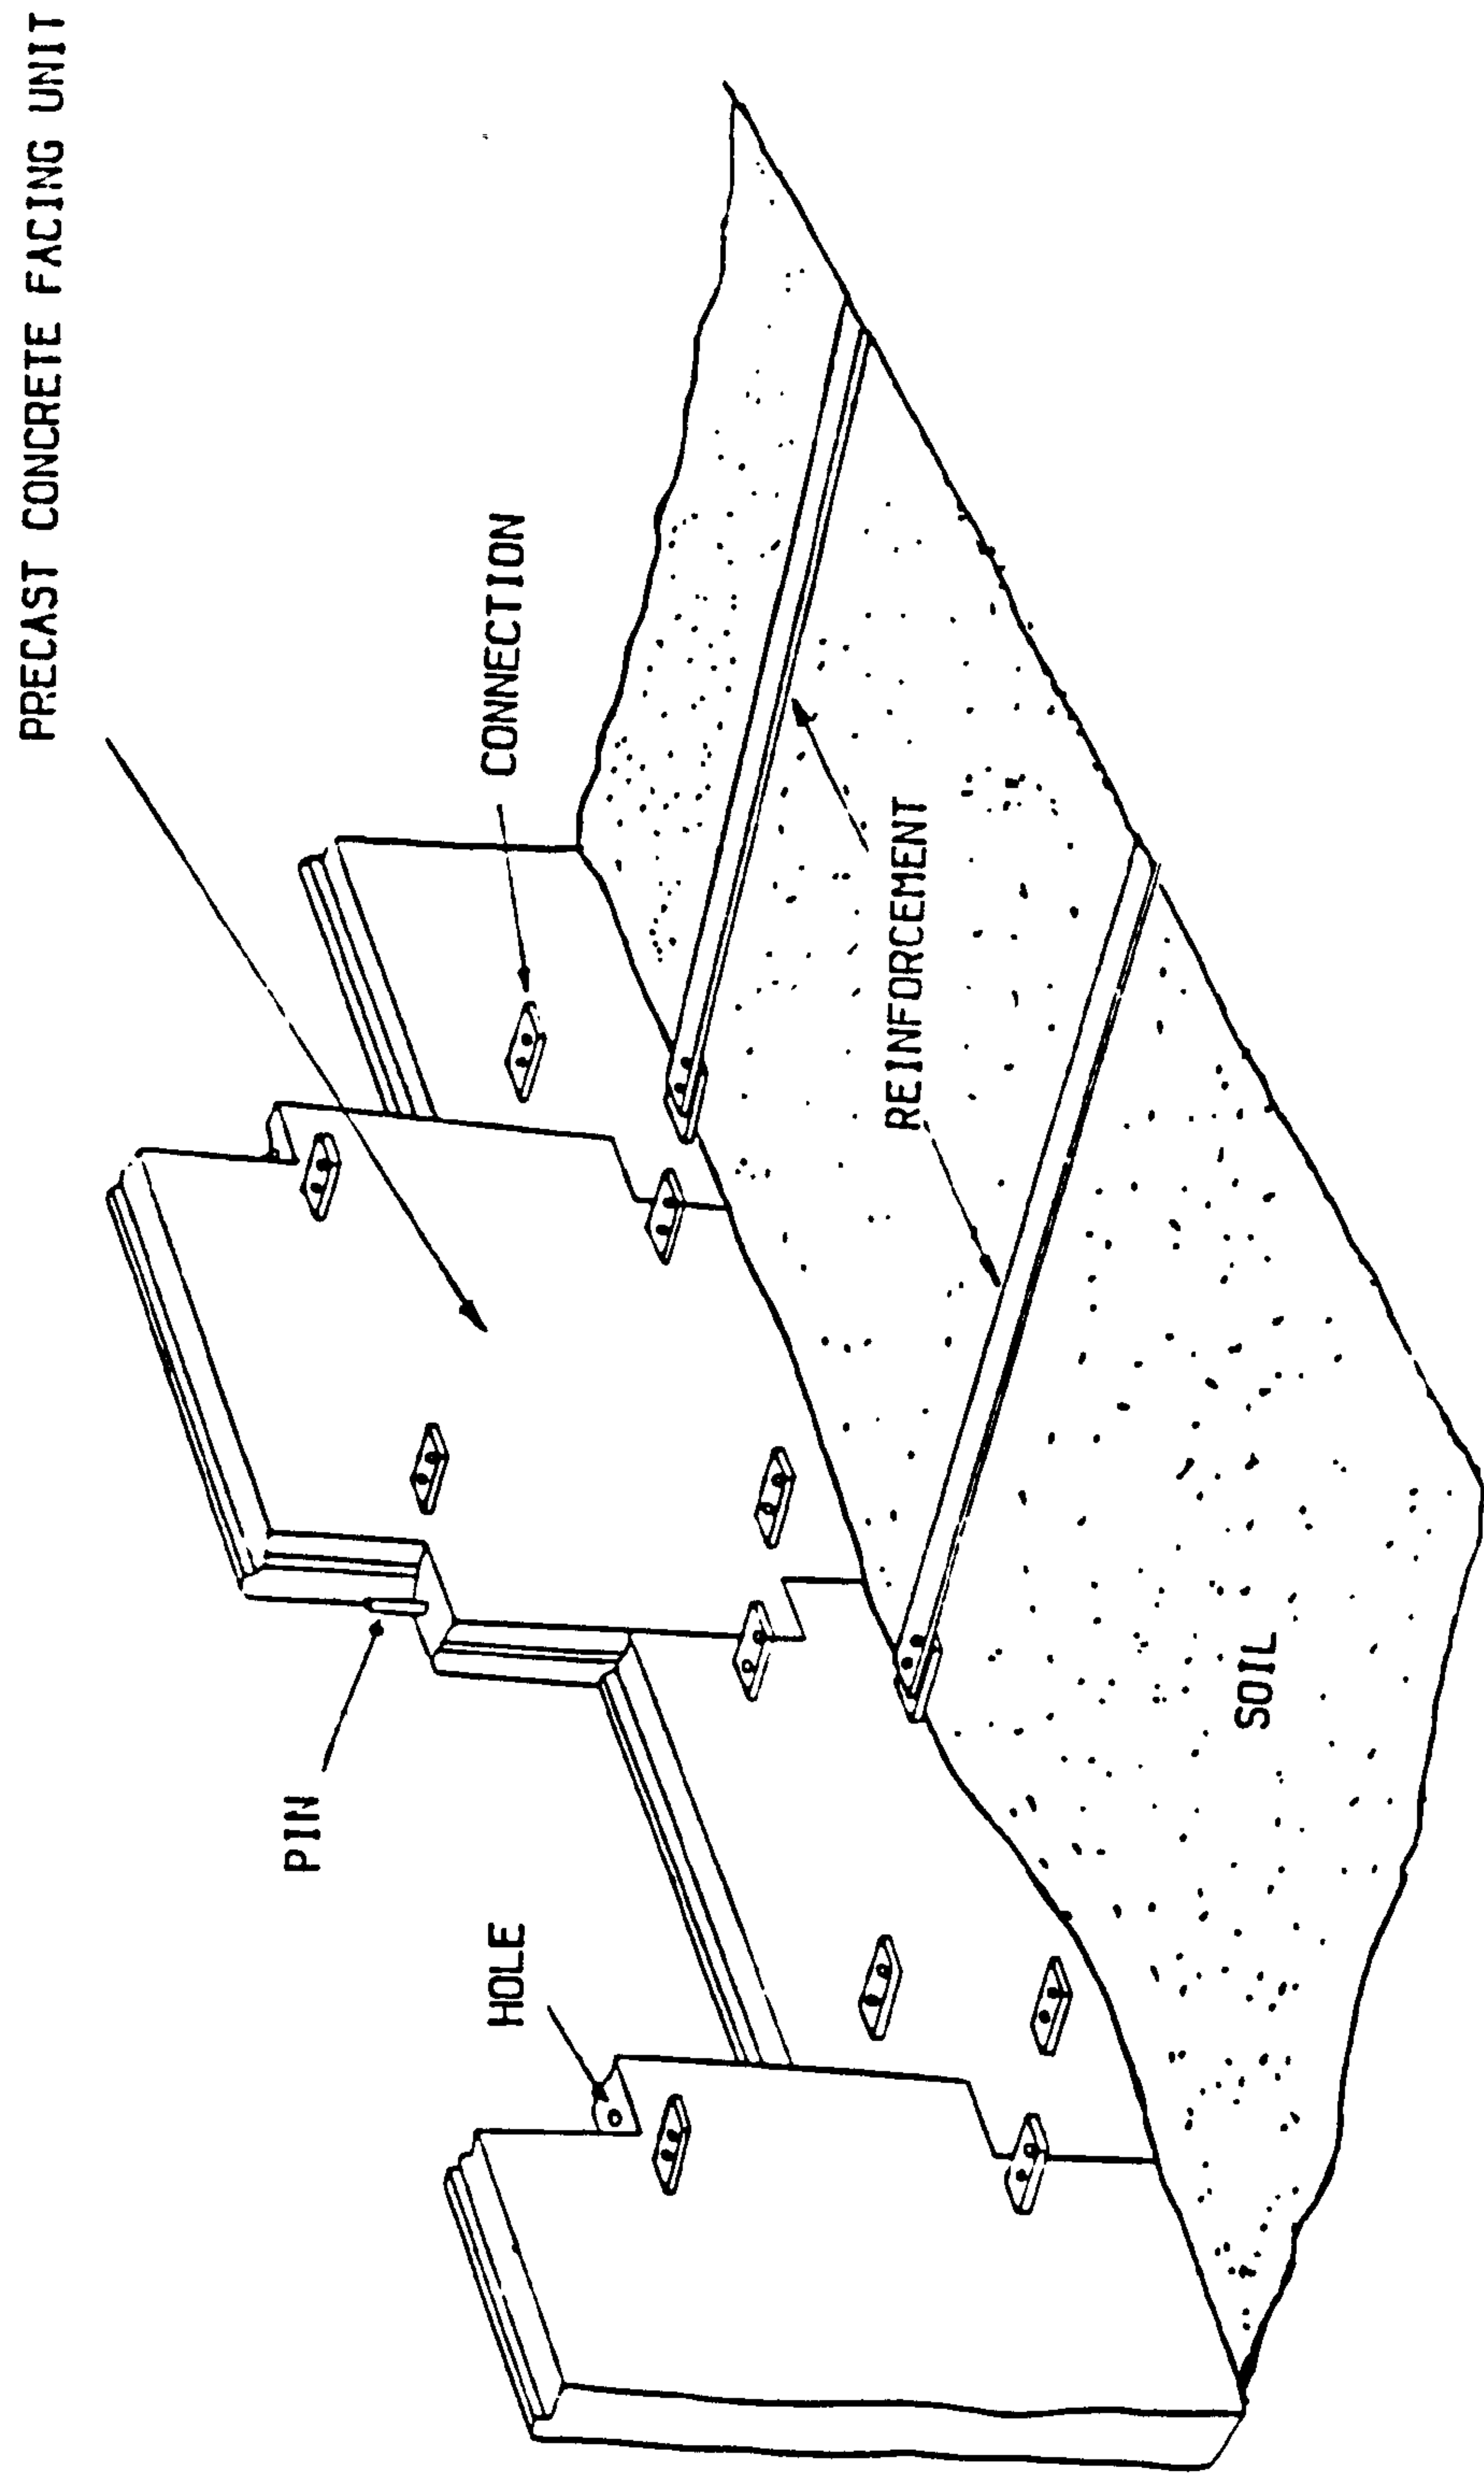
PRECAST FACING UNITS OF REINFORCED EARTH WALL (AFTER VIDAL , 1969).
